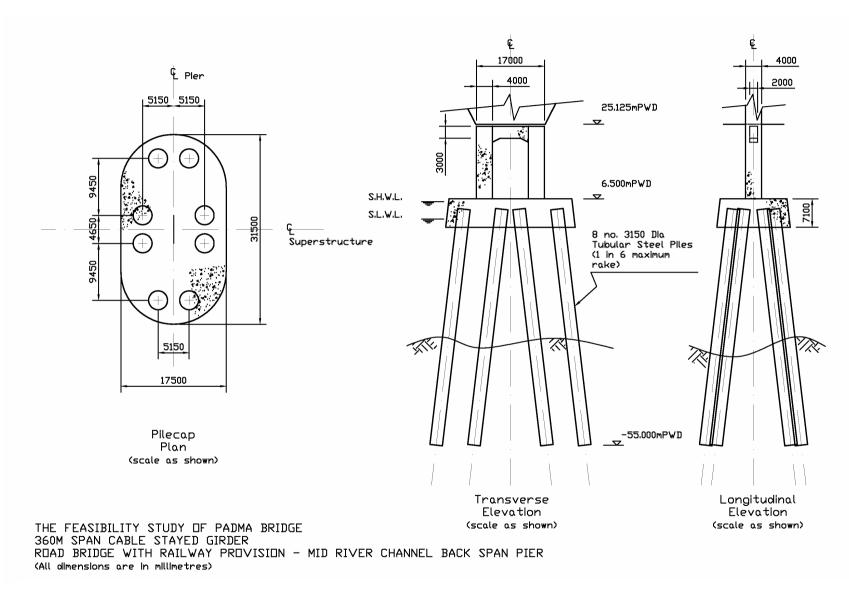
Mid-River Back Span Substructure General Arrangement (Alternative-HR2)
